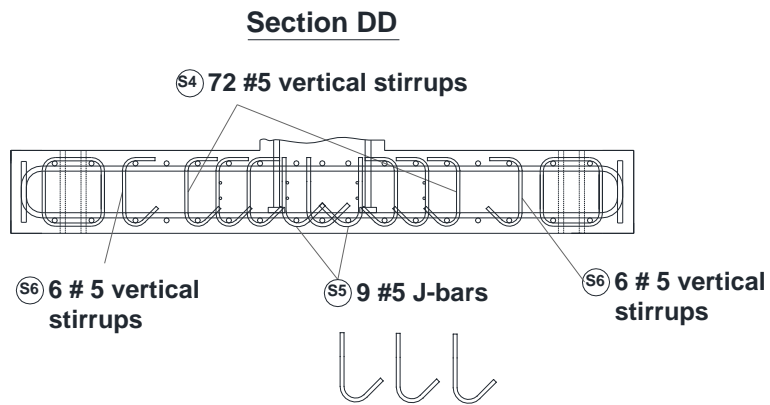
Elevation view of slab reinforcement at Section DD for Specimen #2
